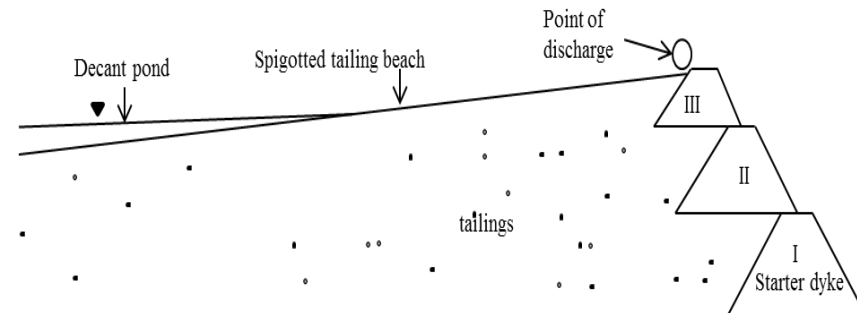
U/S method of tailings dam construction (recreated after Vick, 1990)
